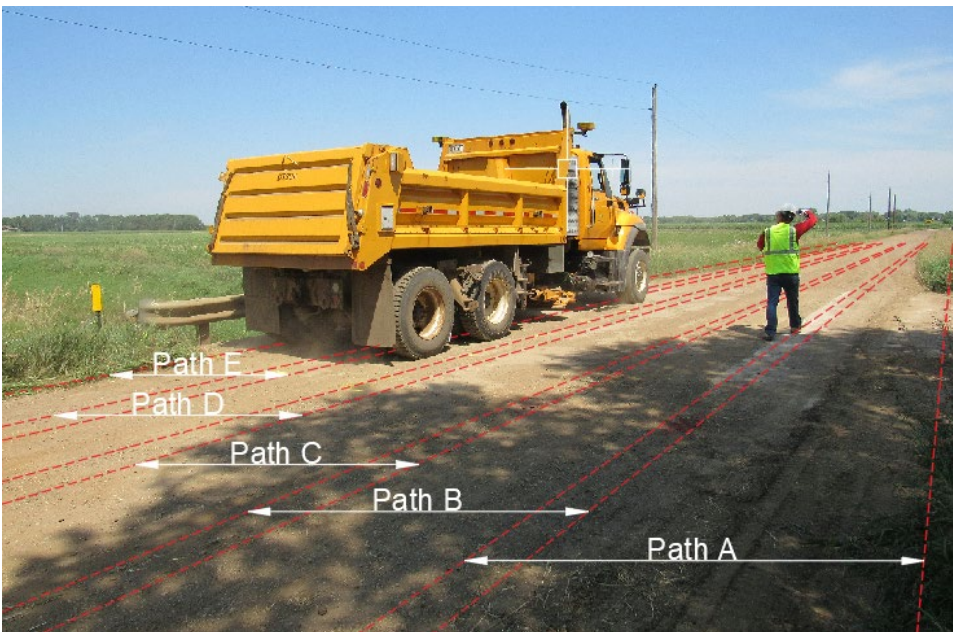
Photograph of Truck Paths for 30-in. (762-mm) Deep Double-Tee Girder Bridge
